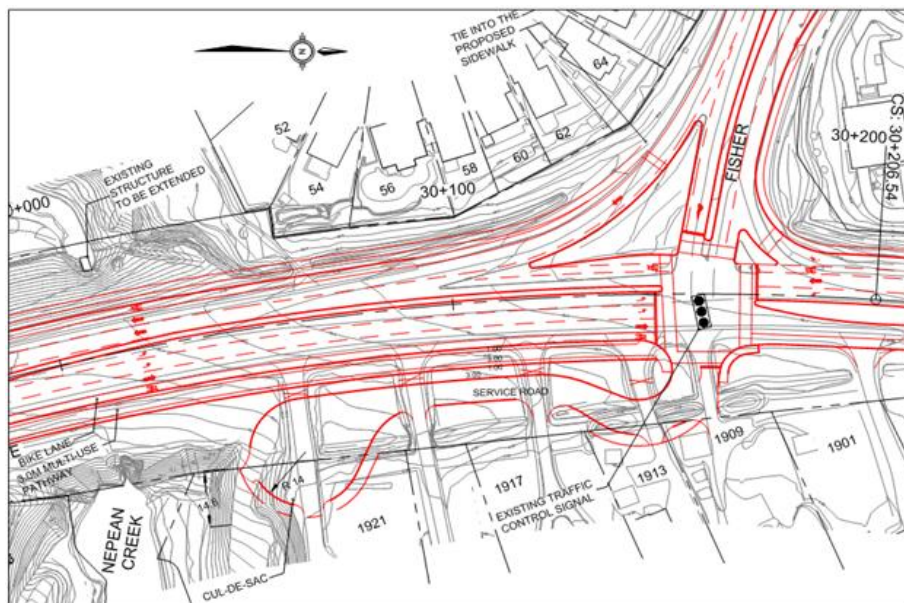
Service Road and Fisher Avenue Intersection Modification
